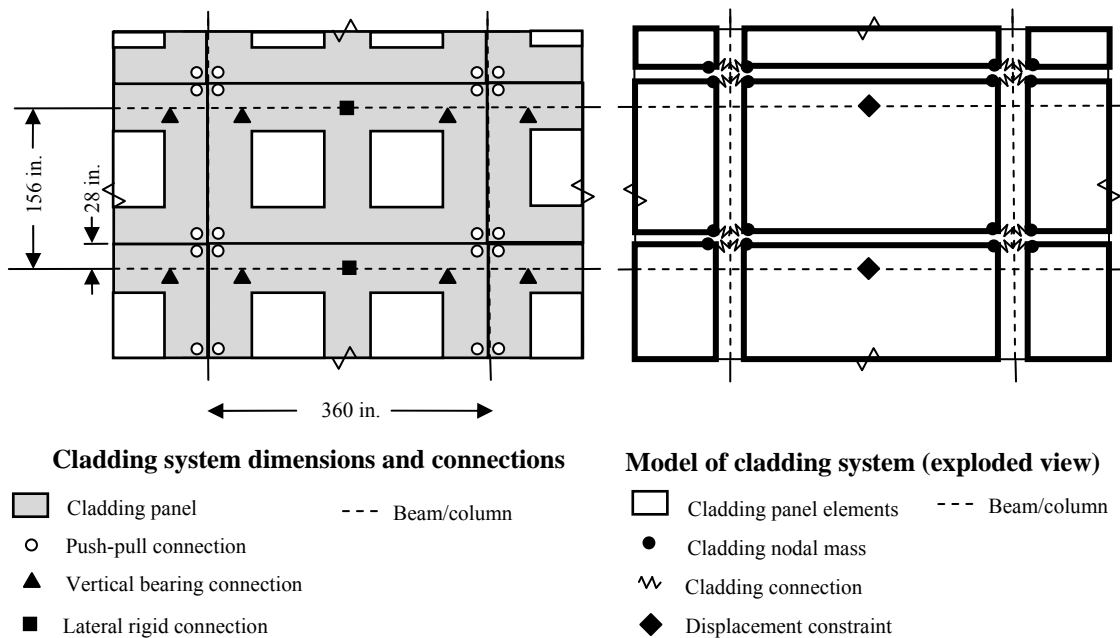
Detailed elevation of Model C2: (left) view showing connection types, (right) model view
